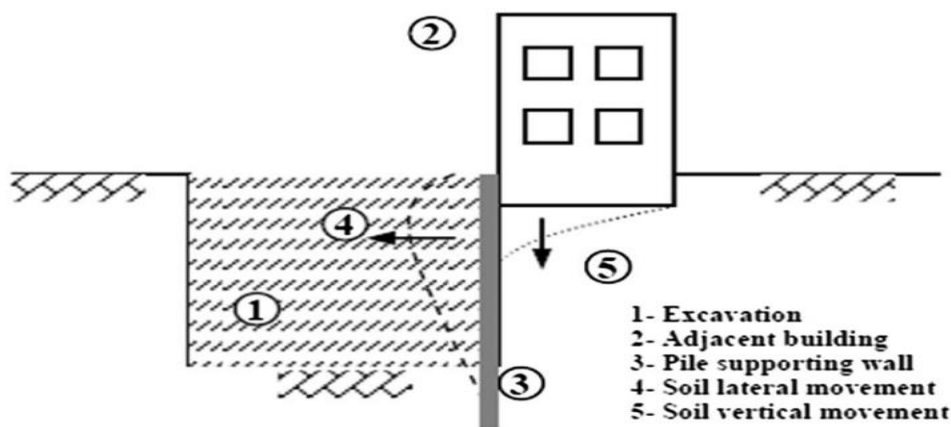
MODEL OF EXCAVATION, ADJACENT AREA, AND BUILDING
